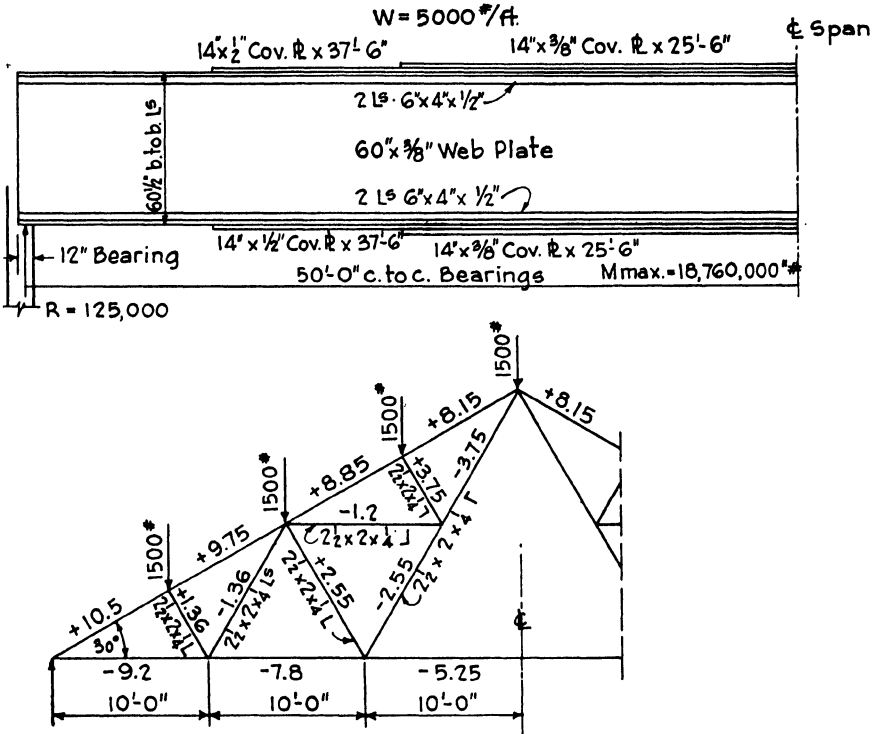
Engineer's Diagrams for Plate Girders and Trusses.
